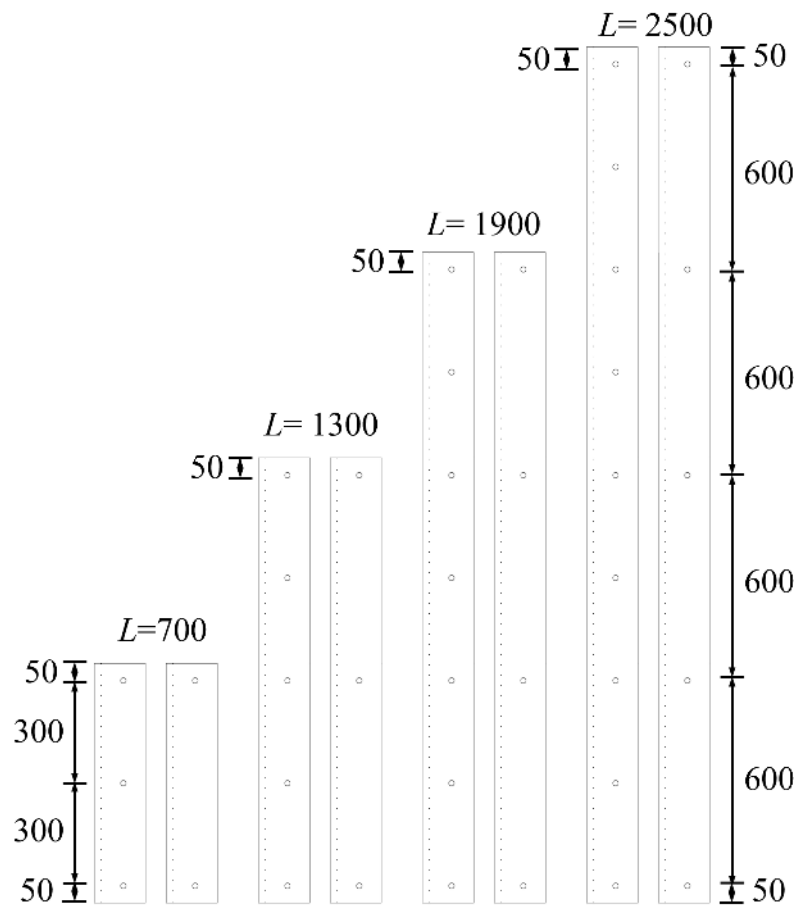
Nominal lengths of the specimens and fastener spacing (all dimensions in mm)
